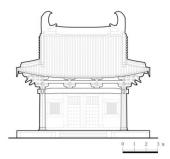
Facade of the main hall reconstruction Drawing by Yu Ding
